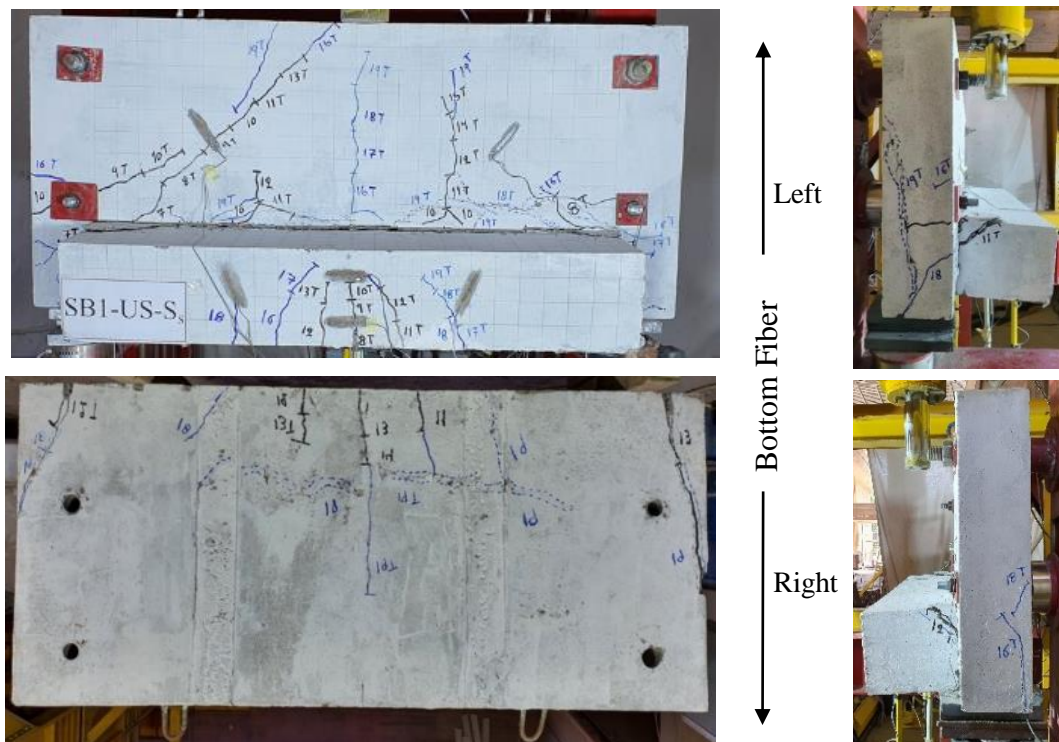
Cracking pattern and failure mechanism of spandrel beams.
